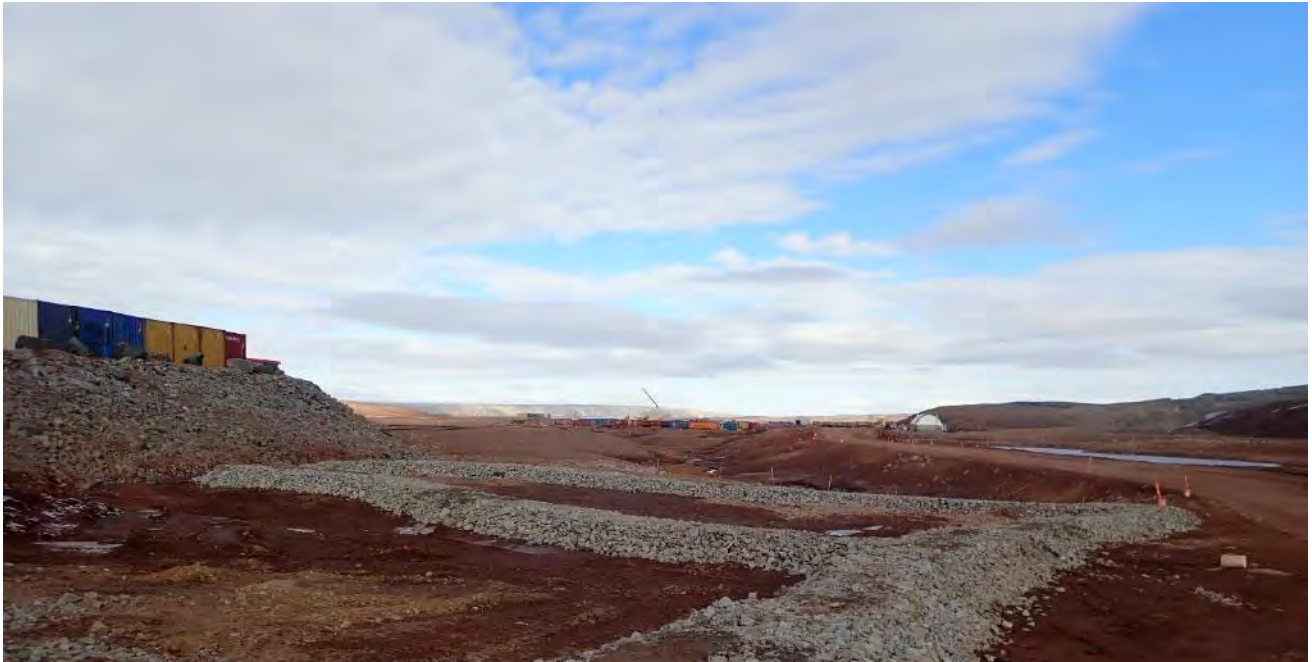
Check dam construction at the outlet of CV-186 on May 22, 2019
